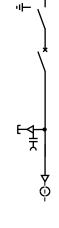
Incoming feeder panel 1250 A
